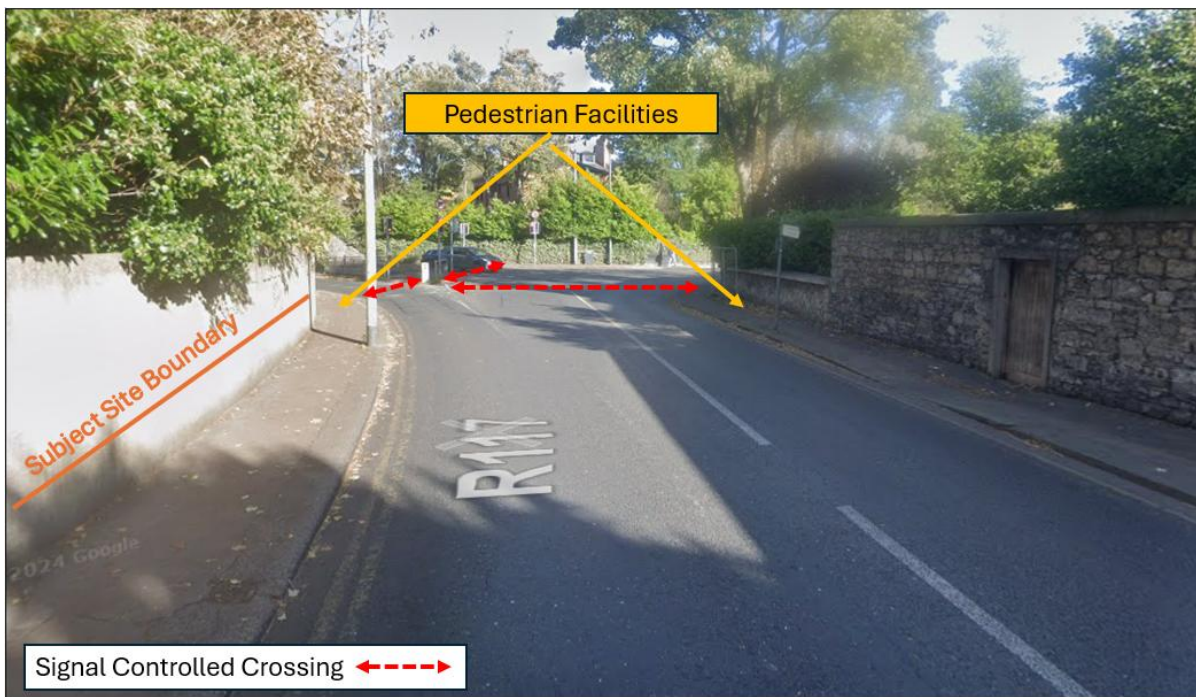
Existing Pedestrian Facilities along Milltown Road at junction with Sandford Road/Eglinton Road
